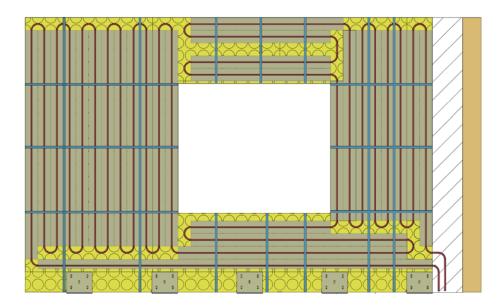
PREFABRICATED FAÇADE MODULE WITH HEATING LAYER ON TOP OF THE STANDARD STRUCTURE, AND WALL- MOUNTED ANCHORS AT THE BOTTOM (VIEW FROM THE BUILDING). VIA THE CHANNEL ON THE RIGHT SIDE, THE PIPES OF THE MODULE CAN BE CONNECTED TO THE HEATING SYSTEM. AFTER INSTALLING THE PIPES, THE CHANNEL IS INSULATED AND CLOSED. THE BROWN BAR ON THE RIGHT INDICATES THE FRAME OF A NEIGHBORING MODULE.
